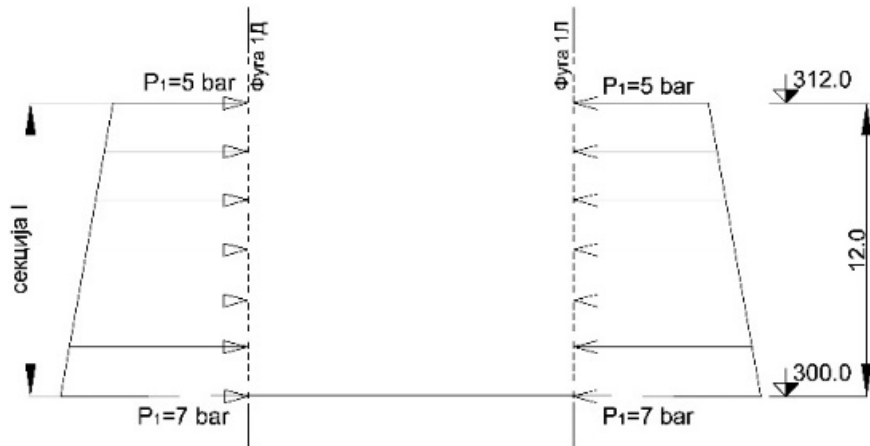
Grouting load (pressure) for section I in joints 1L (left) and 1R (right)
